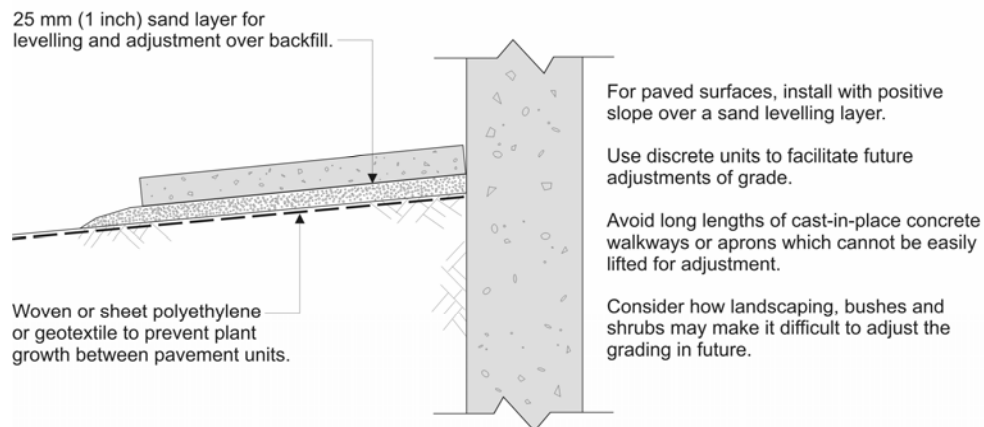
Installation of paved surfaces adjacent to the basement walls.
